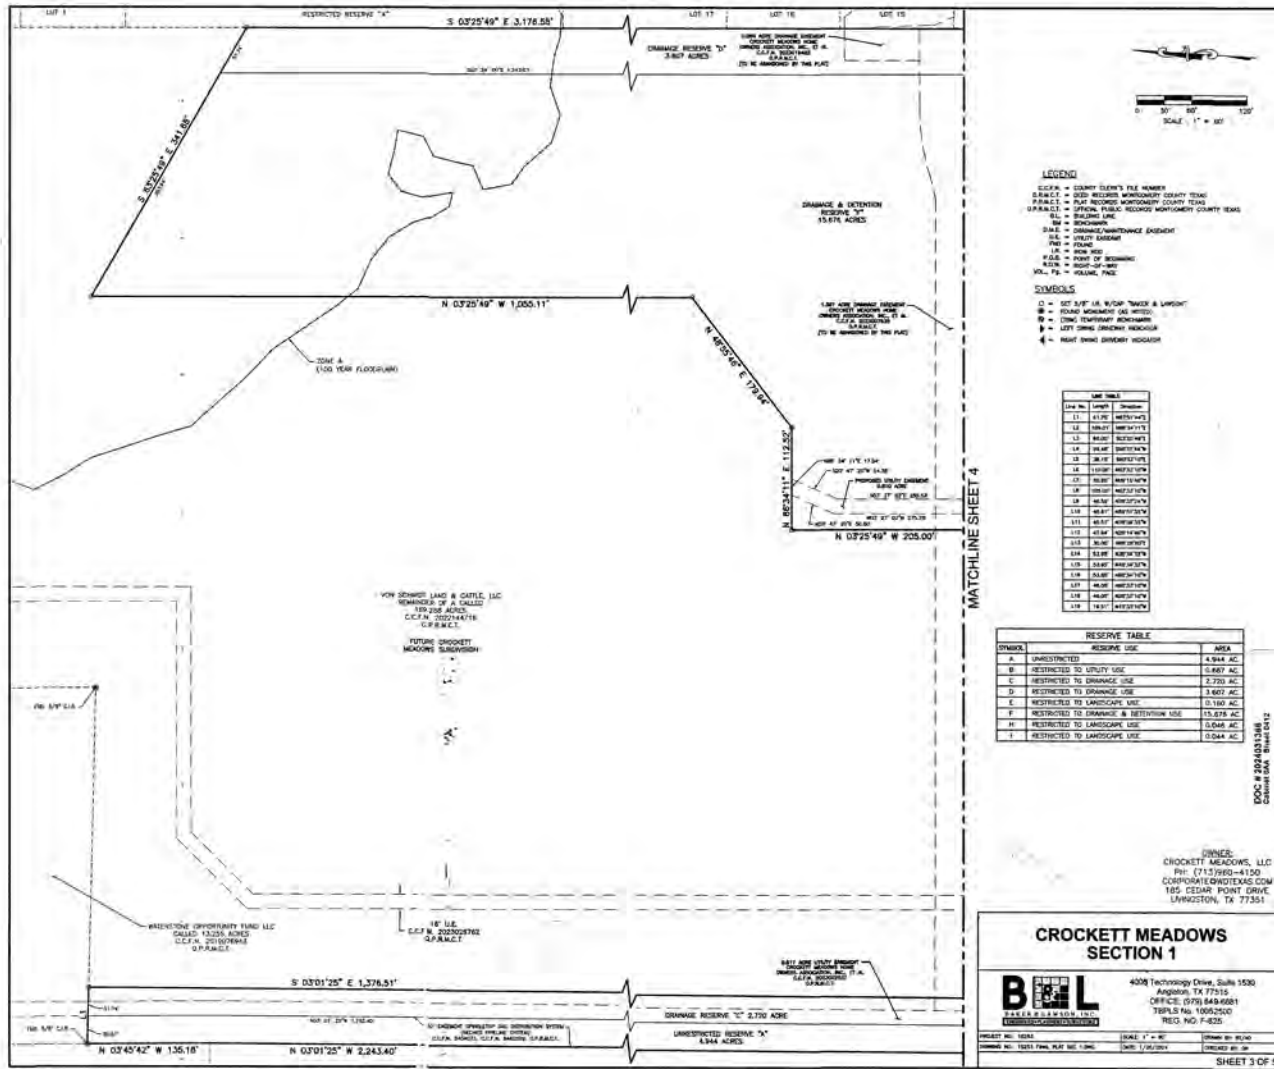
EXHIBIT H - IMPROVEMENT AREA #1 SECTION 1 PLAT
